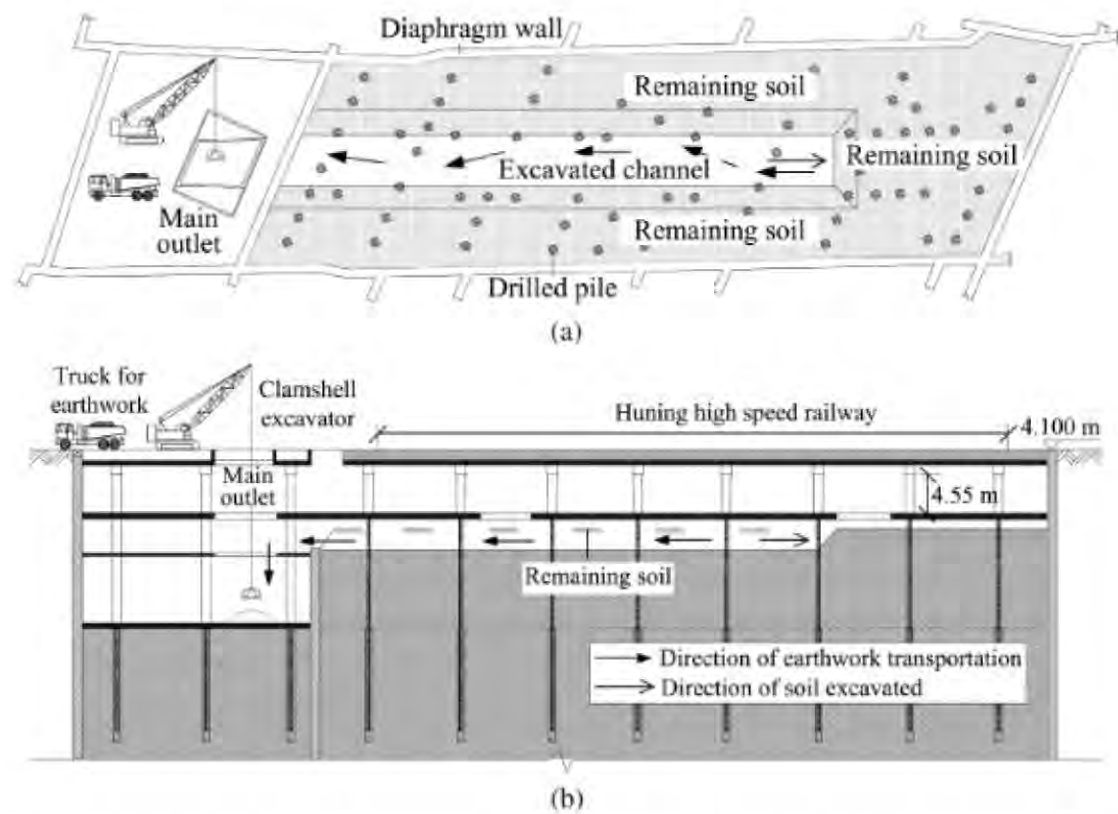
Excavating channel in the middle of excavation: (a) plan view of channel excavated; (b) profile of channel excavated
